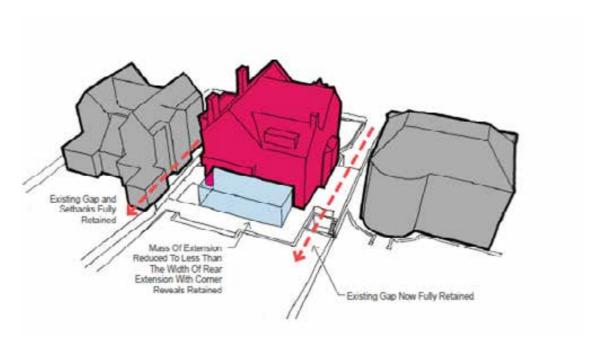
Sketch - from Planning Application 2014/3625 P
